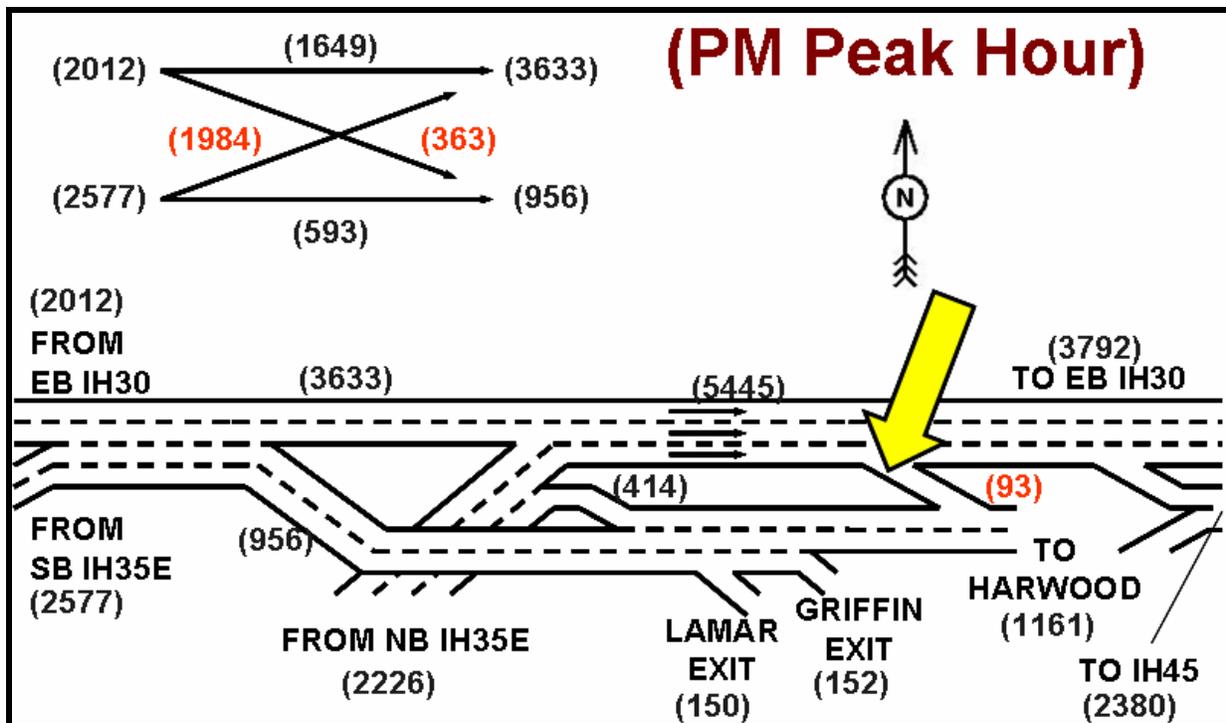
Site 3: Eastbound IH 30 in Dallas – Before Layout.
